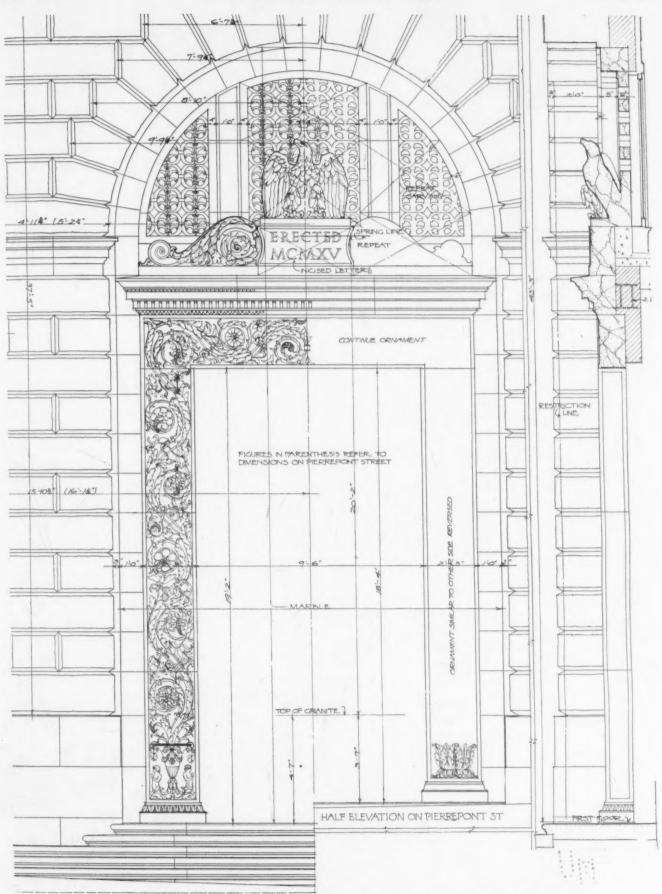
DETAIL OF ENTRANCE DOORWAYS ON PIERREPONT AND MONTAGUE STREETS
